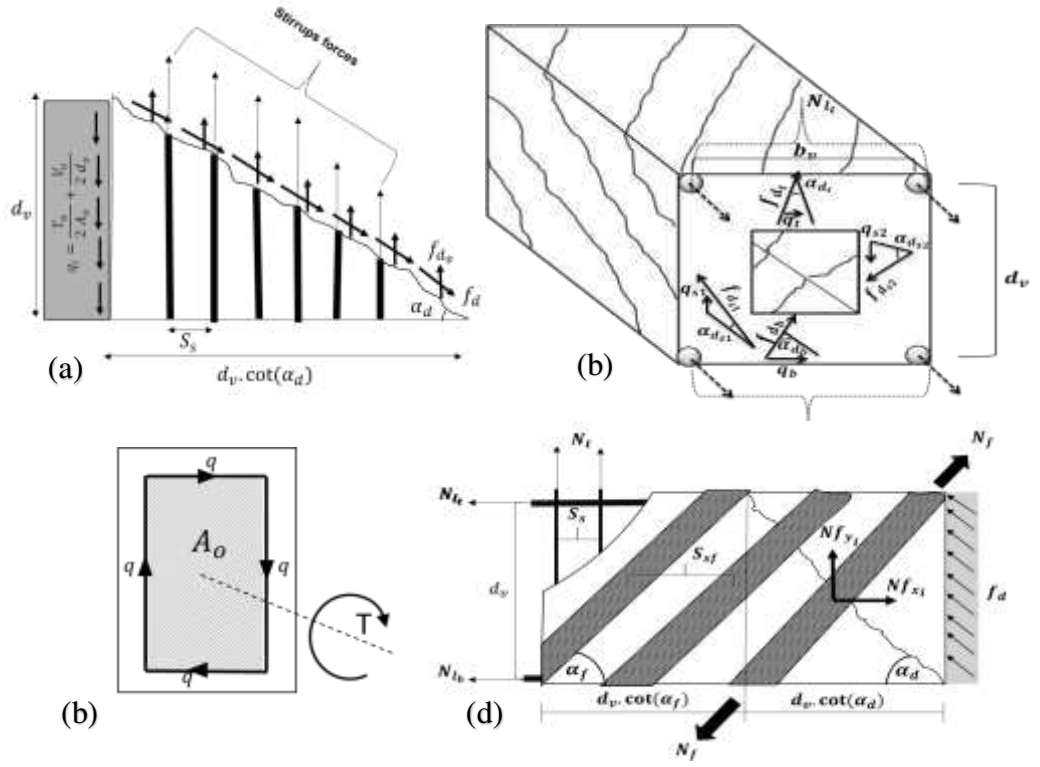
(a) Truss mechanism at the side wall, (b) Space truss mechanism, (c) shear flow and the section's effective area, (d) Truss mechanism for inclined fibres.
